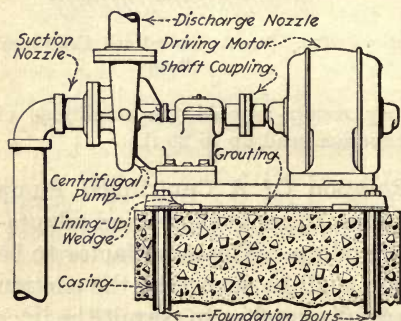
Section Of Foundation Of Centrifugal Pump.
